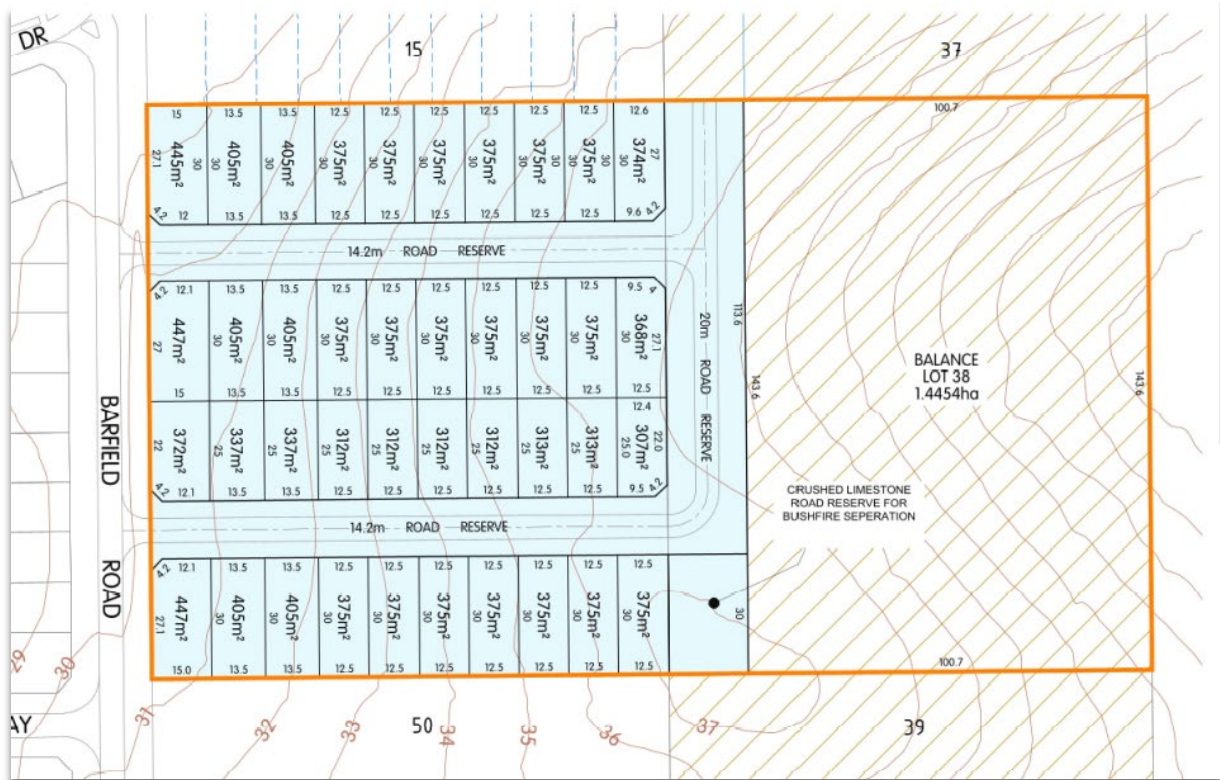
Lot 16 Barfield Road Subdivision Concept Plan
